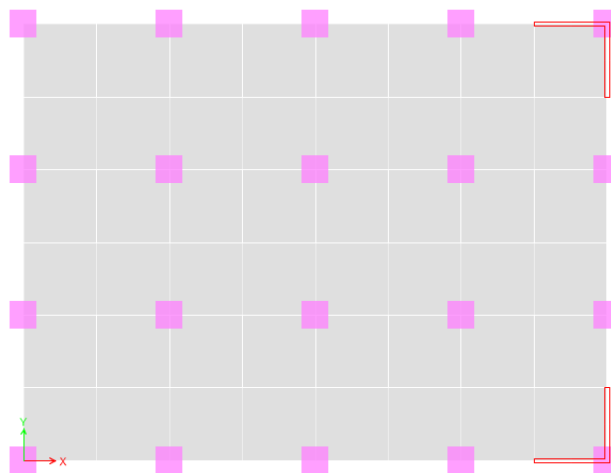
2D plan of 8th story rectangular shape building case SW5
